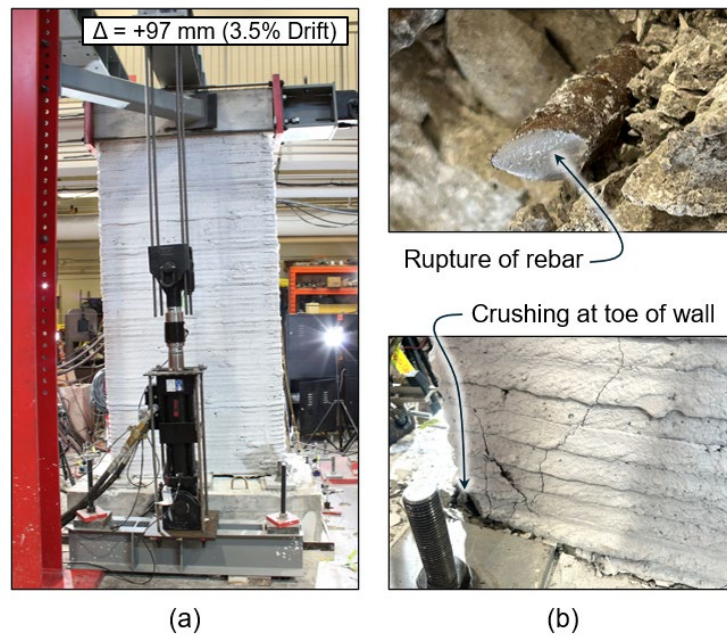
Observed failure modes in wall S4: (a) deformed shape at the ultimate drift, (b) typical rupture of longitudinal reinforcement, (c) observed crushing at the shear wall toes.
